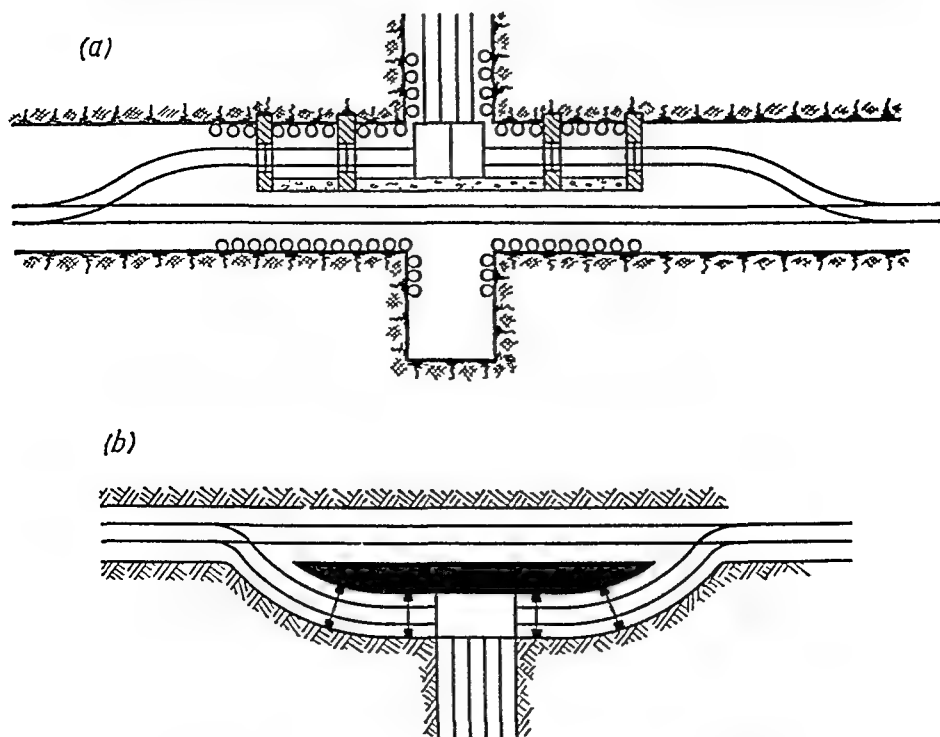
Layouts for the air lock at the foot of a haulage incline
